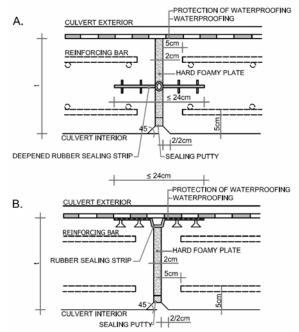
Detail of execution and sealing of expansion joint in case of monolithic construction of box and arch culverts
